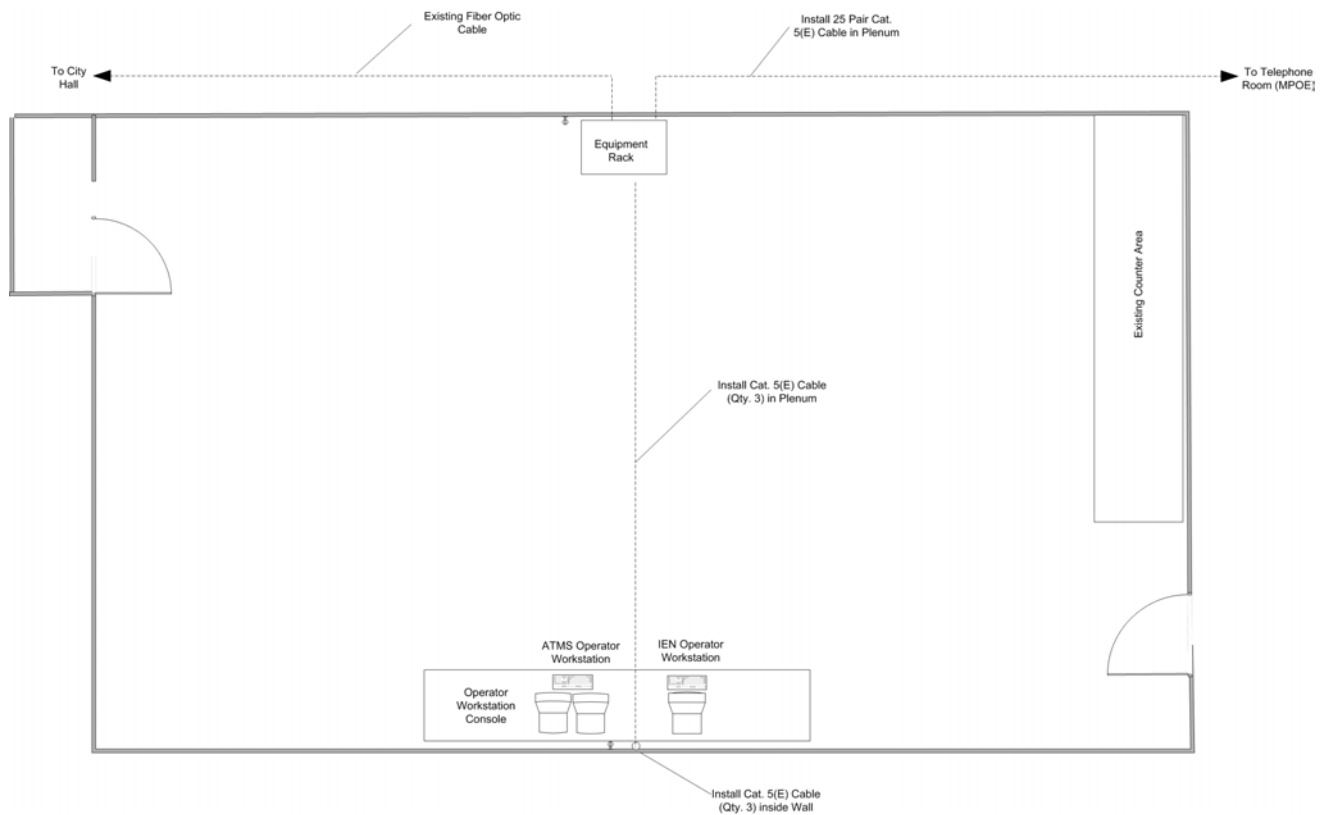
Primary LCC Equipment Rack and Console Layout
